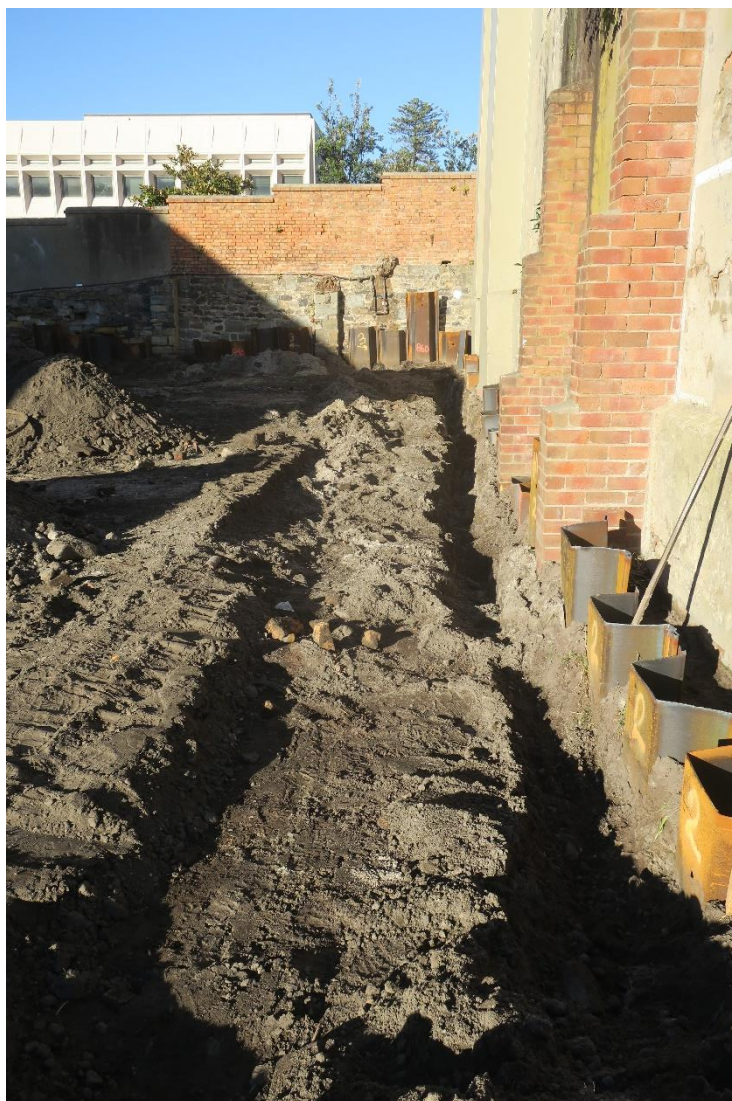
Location of Strip Trench F before excavation, facing south.
